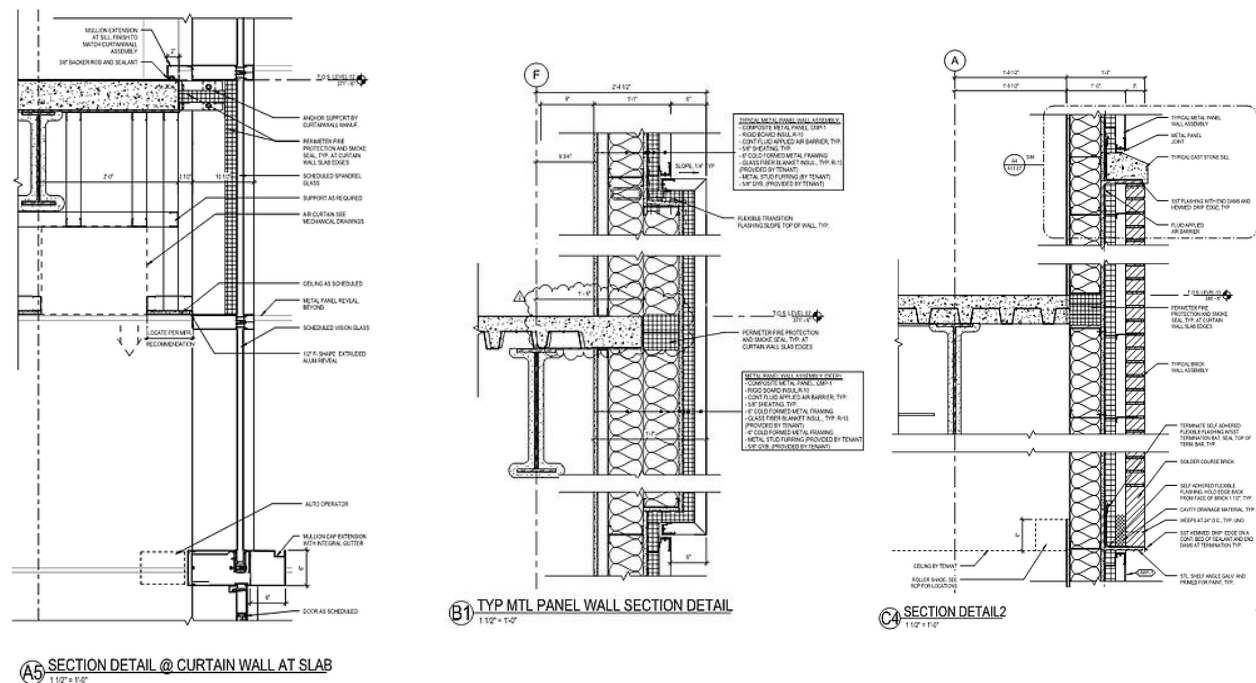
(from left) Curtain Wall detail, Metal Panel Wall detail, Brick Veneer detail
